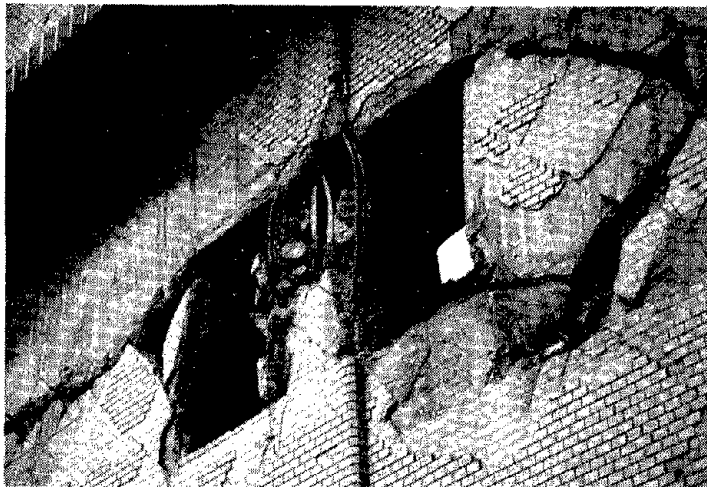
Failed SRC column in the middle of the structural wall shown in Figure 6.72
